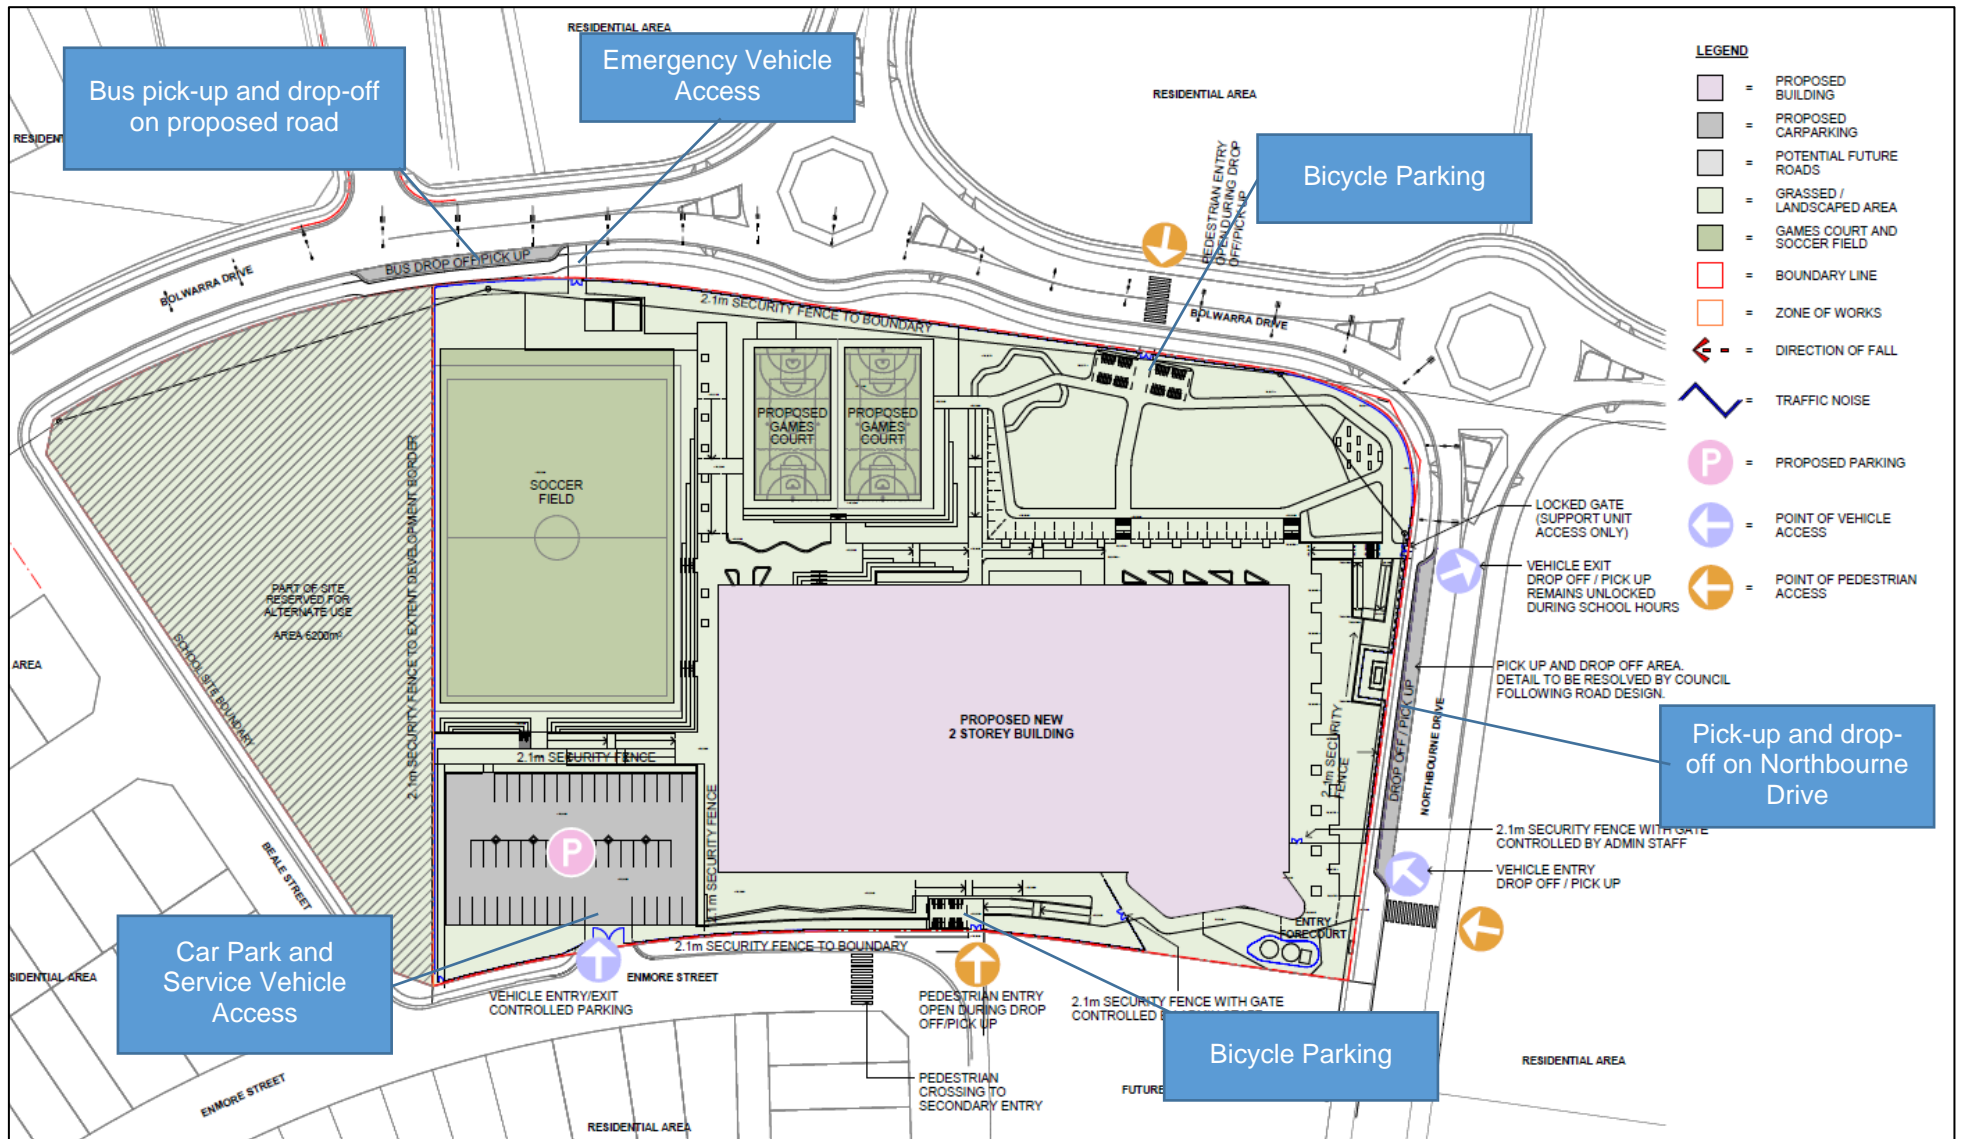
Marsden Park New Primary School Site Development Plan
